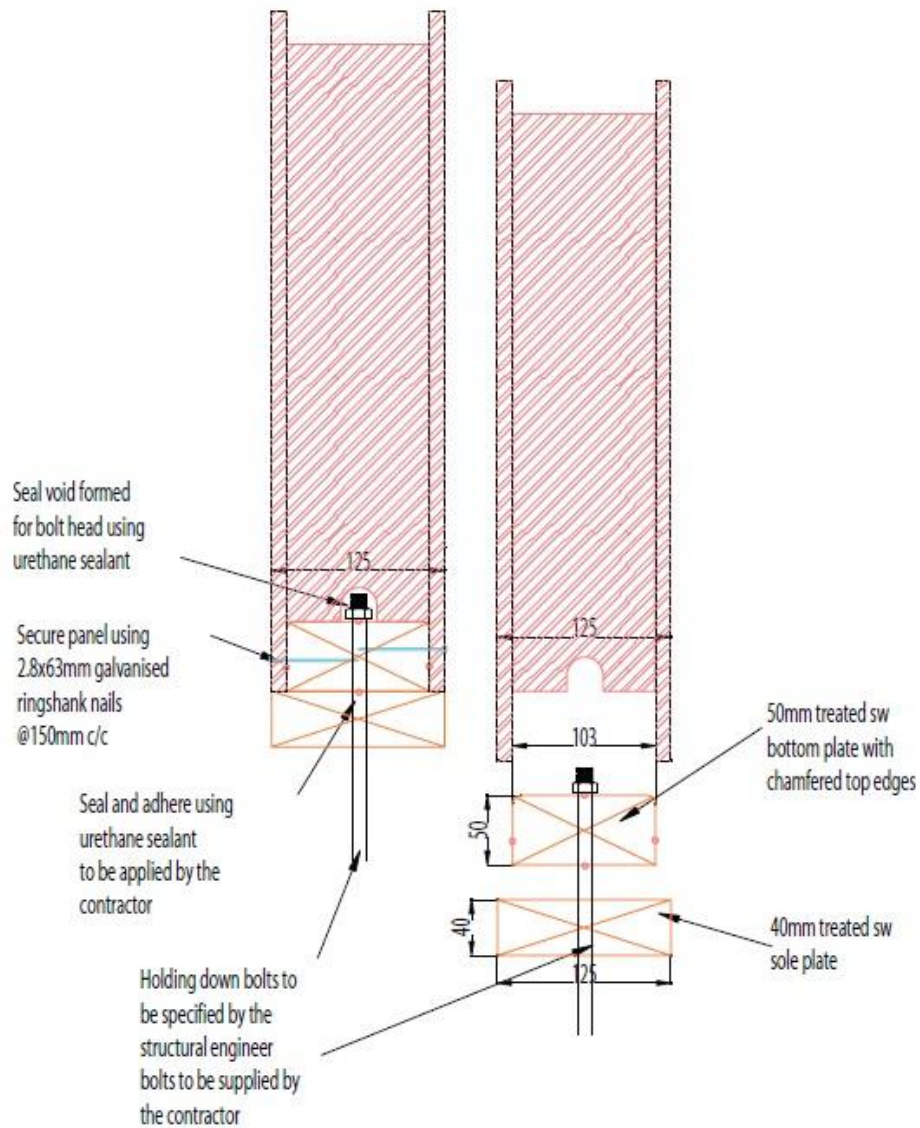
Footer and Sole Plate Details (SIP Build Ltd, 2008)
